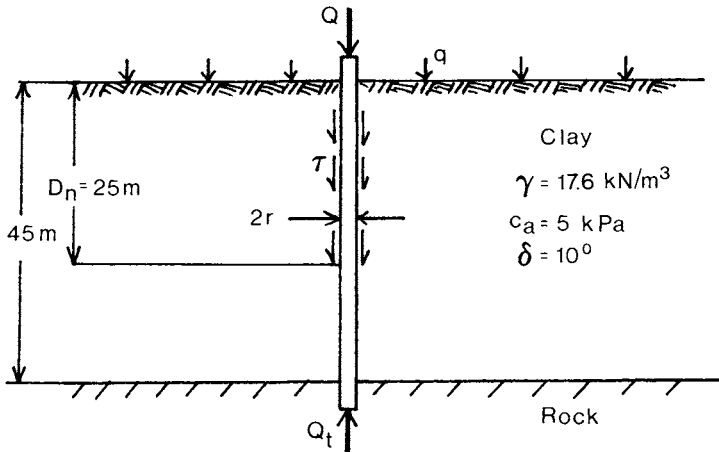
A deep end bearing pile for Problem 3.6.
